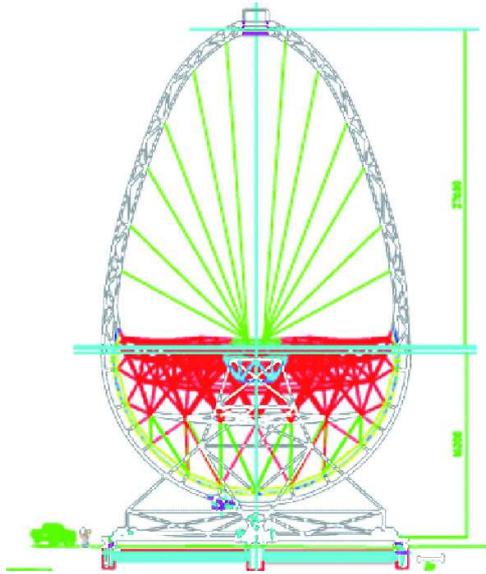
Layout of the 23 m telescope (P. Sawallisch)
